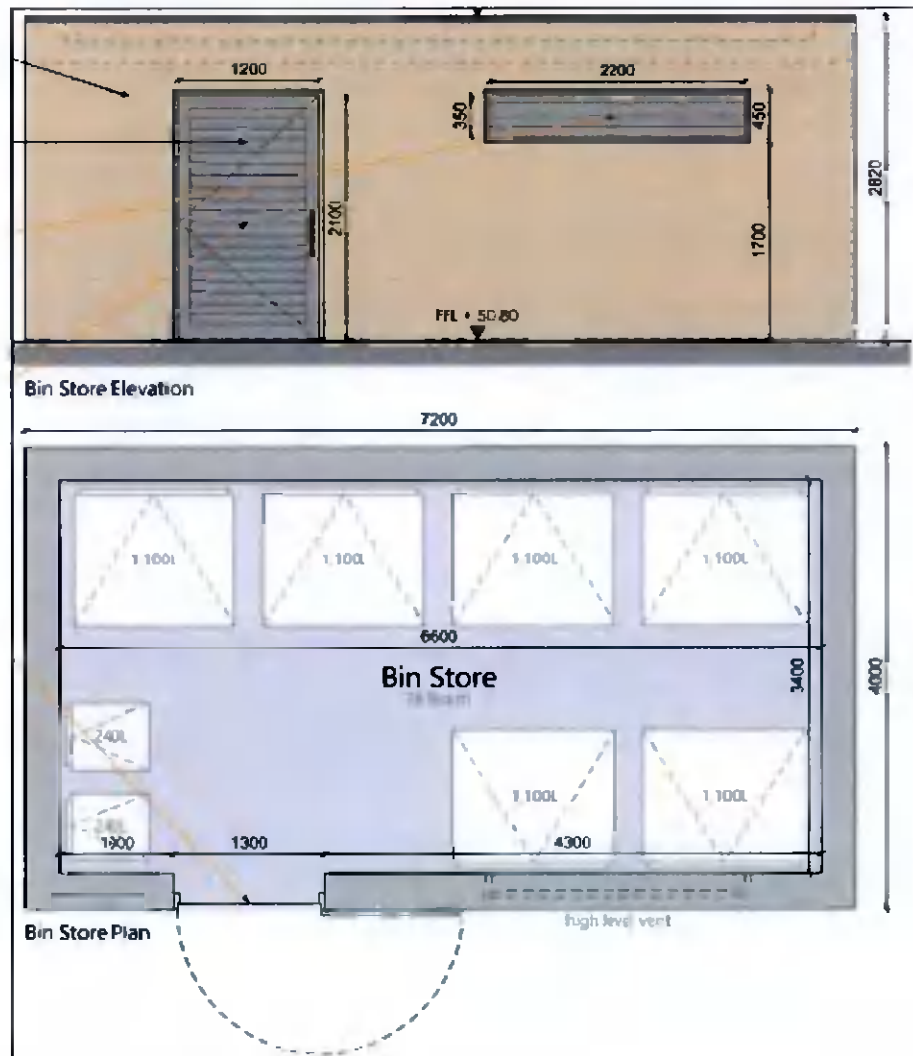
Typical Bin Store Plan (Source: HRA Architects)
